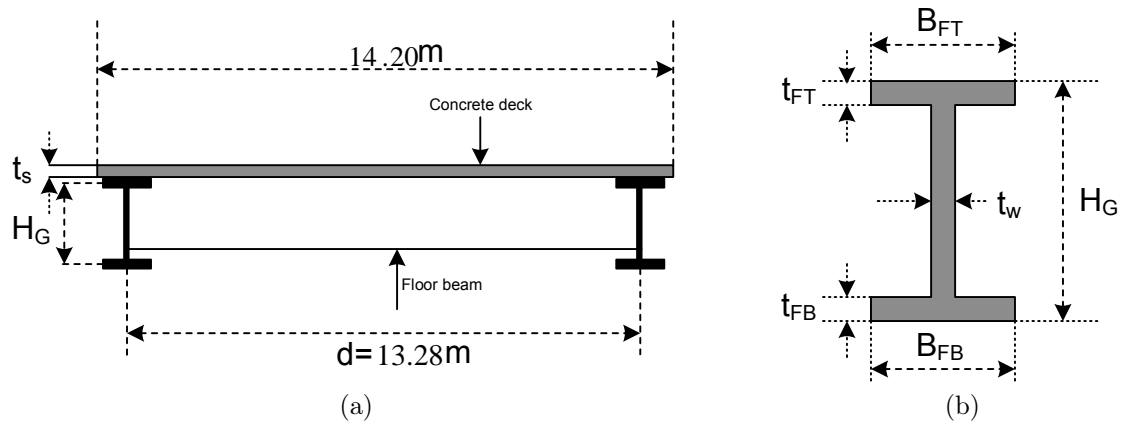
Bridge deck cross section (a) Cross-section of the bridge deck for three arrangement of cable-stayed bridges and (b) Steel main girder.
